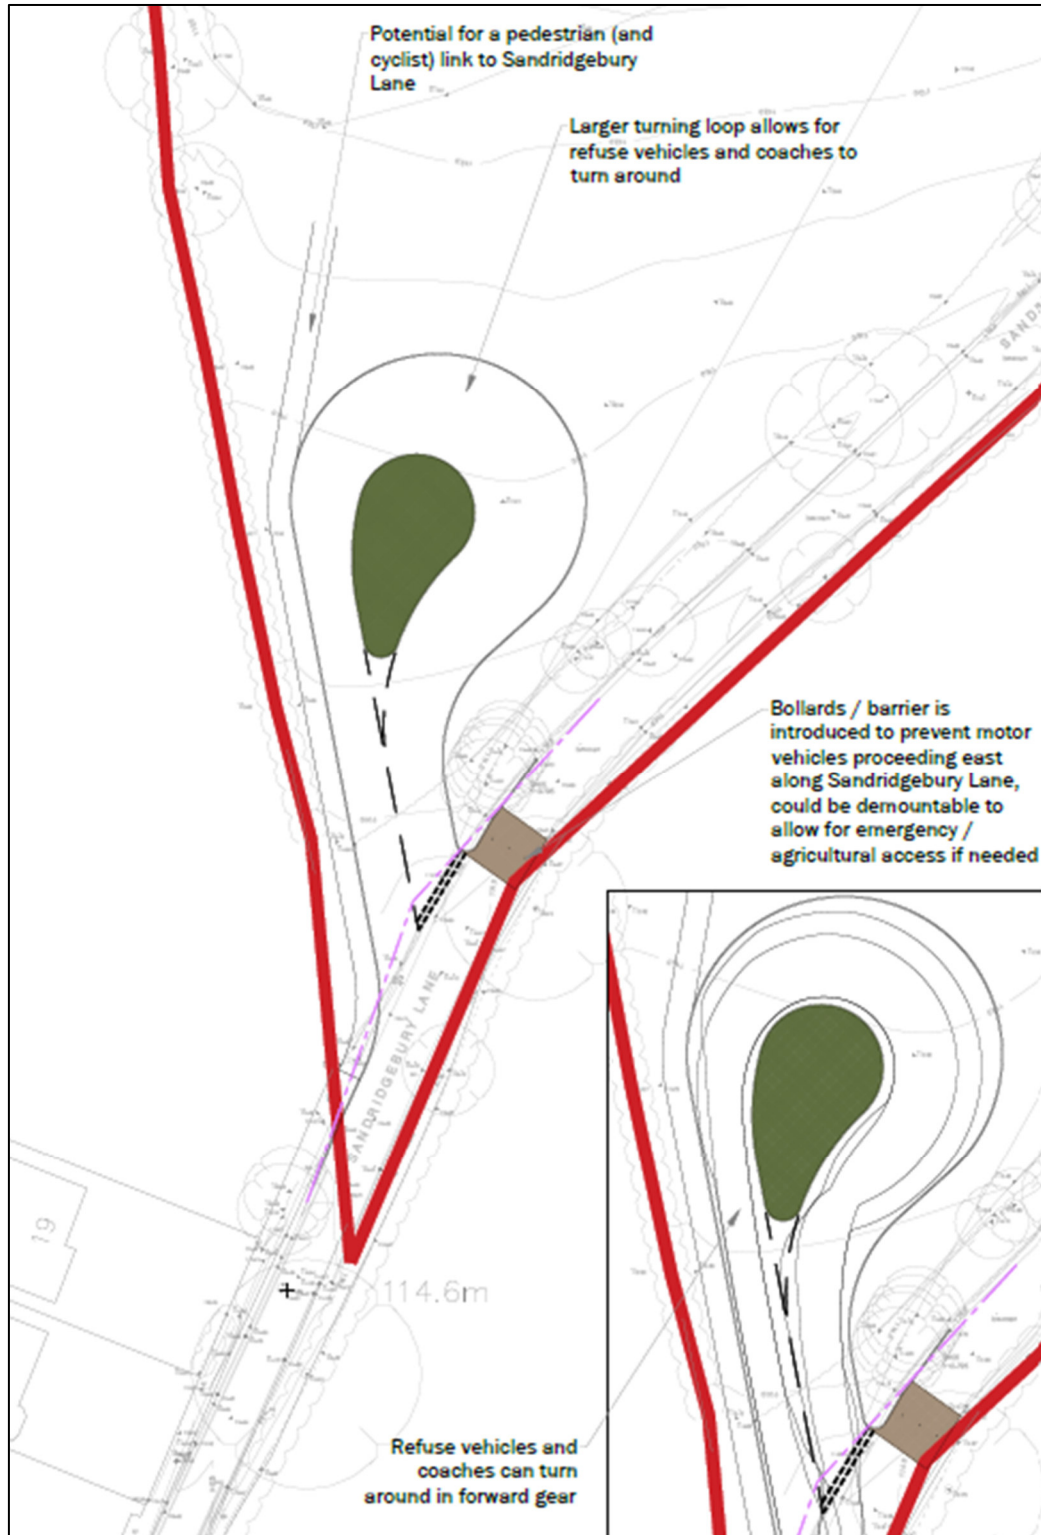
Proposed Sandridgebury Lane – Eastern End (Potential Arrangement)
